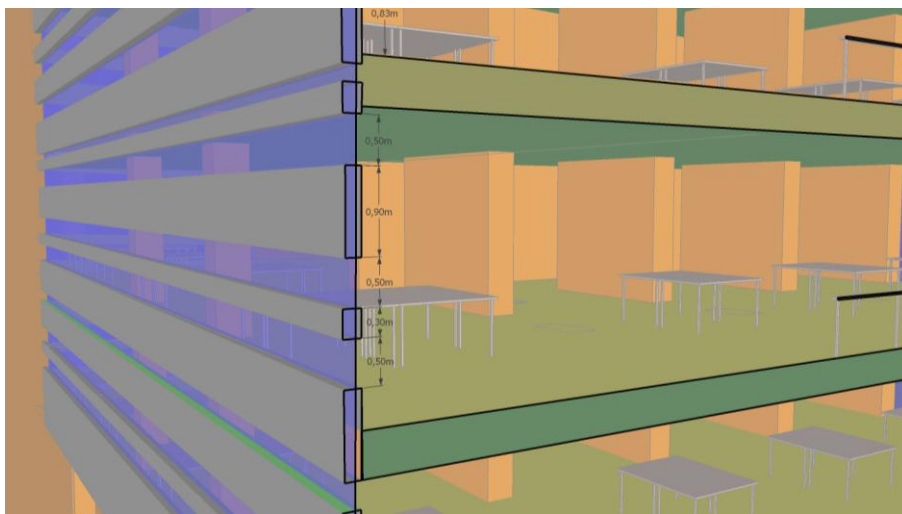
Perspective view of the building with the dimensions of the ribbon windows installed in the North, East, and West façades
